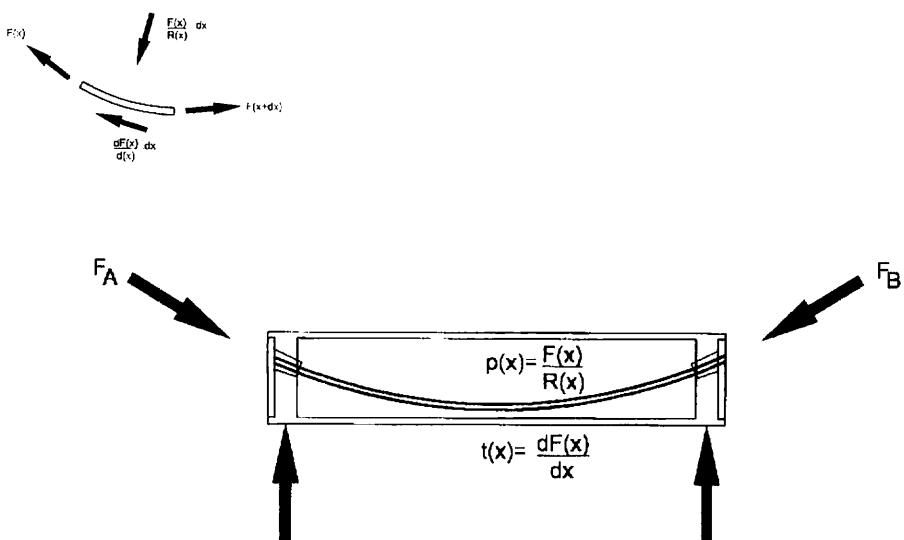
"External" approach of prestressing forces: External forces on concrete
